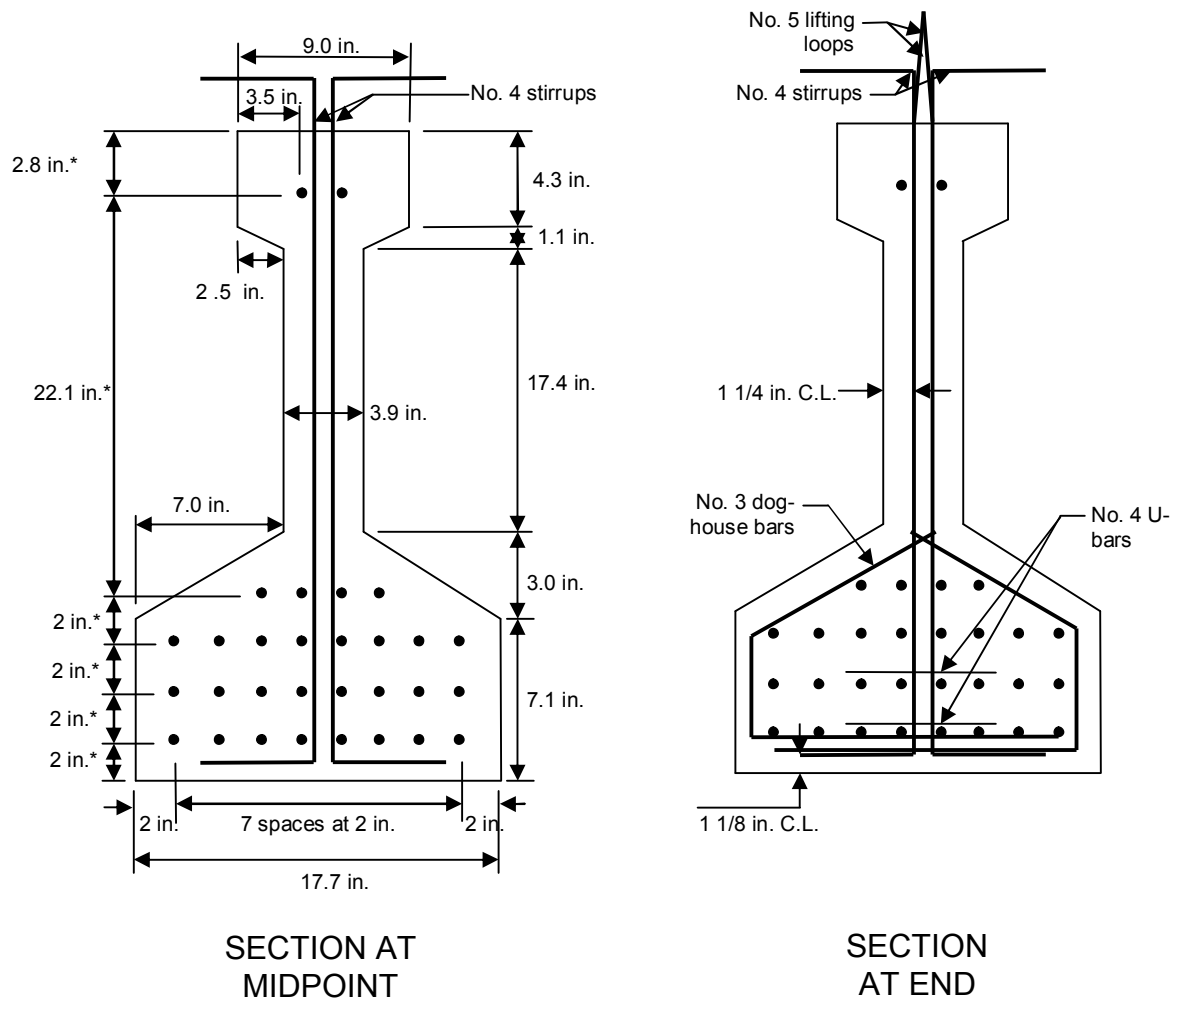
As built cross-section of precast prestressed UHPC girder 3 (reduced top flange). See Chapter 5 for design dimensions.
